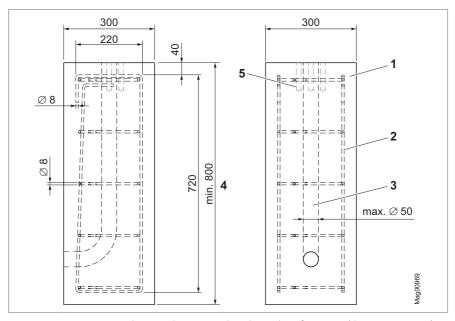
Foundation and empty conduit plan and reinforcement (dimensions in mm)
